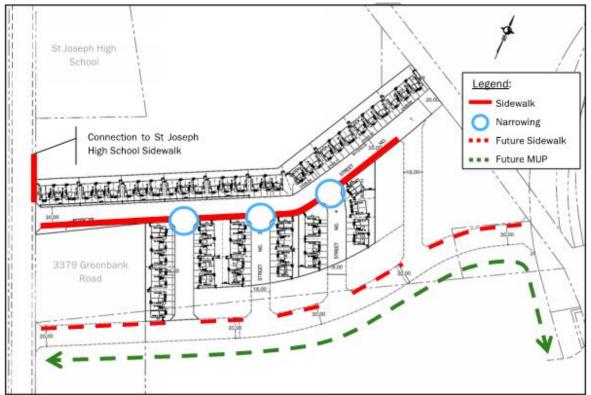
Proposed Pedestrian and Cycling Connectivity Plan (Source: Parsons TIS, April 2017)
